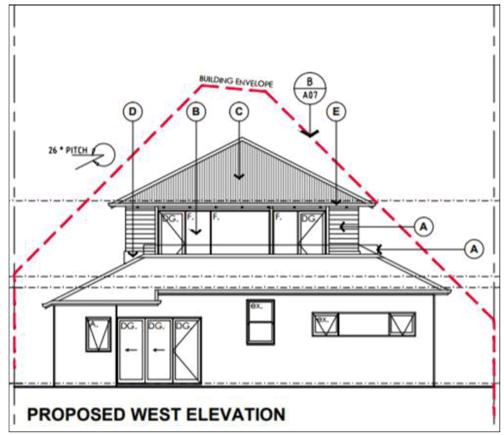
Proposed rear elevation, facing 11 Alexander Street.
